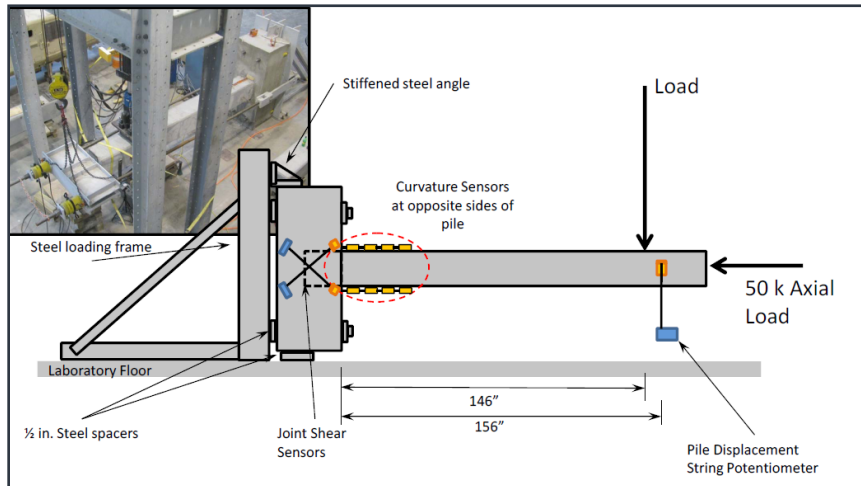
Pile cap beam connection model tested at the University of South Carolina
